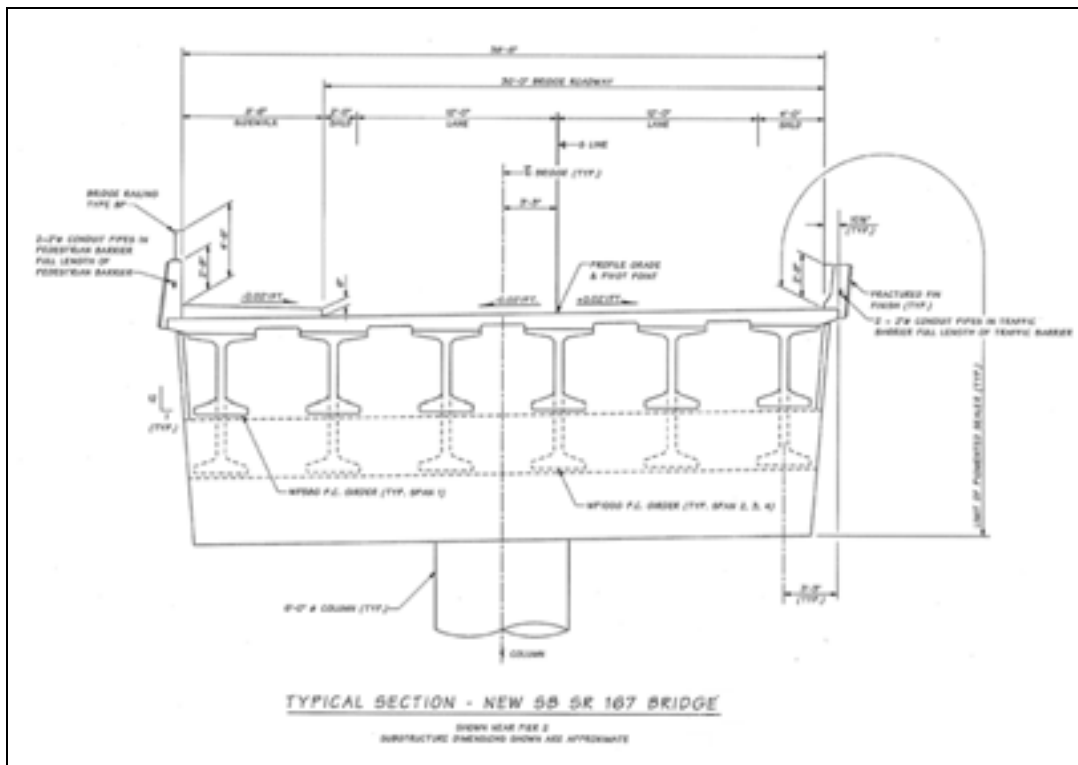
Typical Cross Section of Proposed New SR 167 Southbound Bridge
